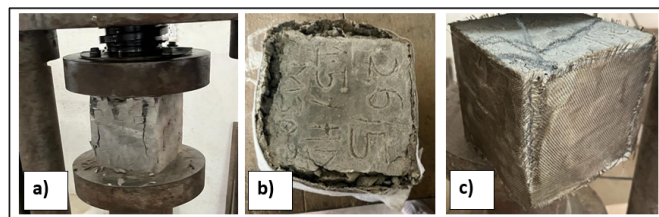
Crack Patterns of concrete samples (a) Plain Concrete (b) Geo-FRP Wrapped and (c) BFRP Wrapped
